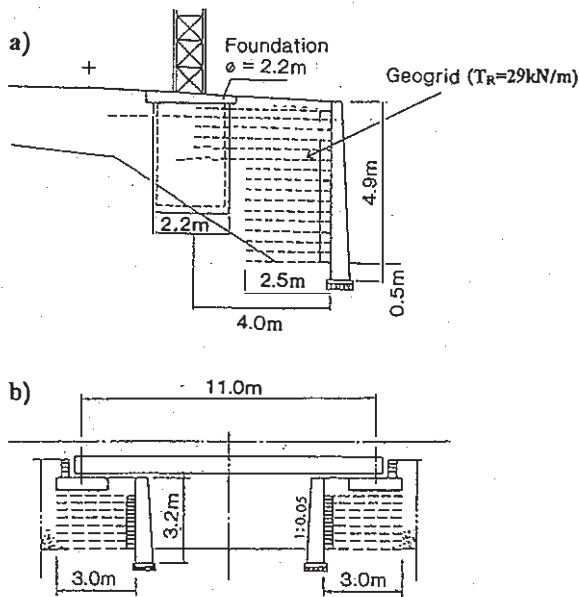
a) Typical cross-section of Amagasaki No. 1 GRS-RW and b) typical GRS bridge abutments (GR4 in Fig. 3).
